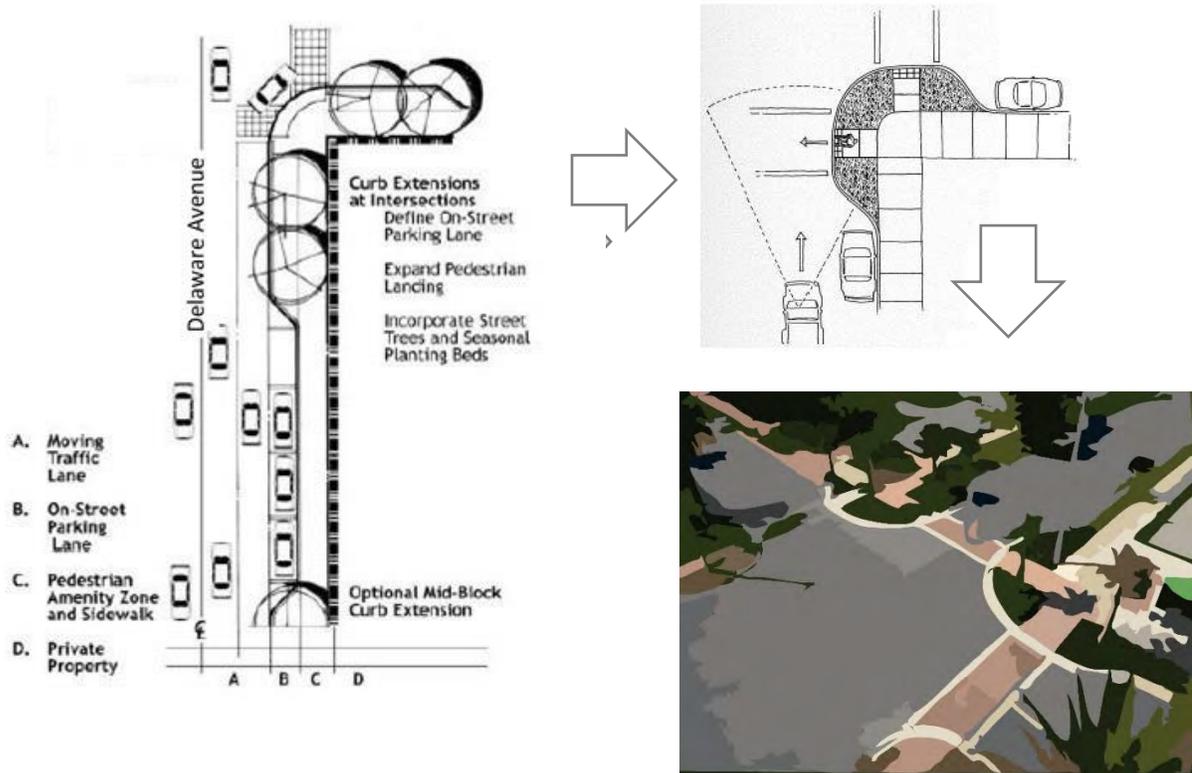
Proposed Crosswalk Design on Site 1
